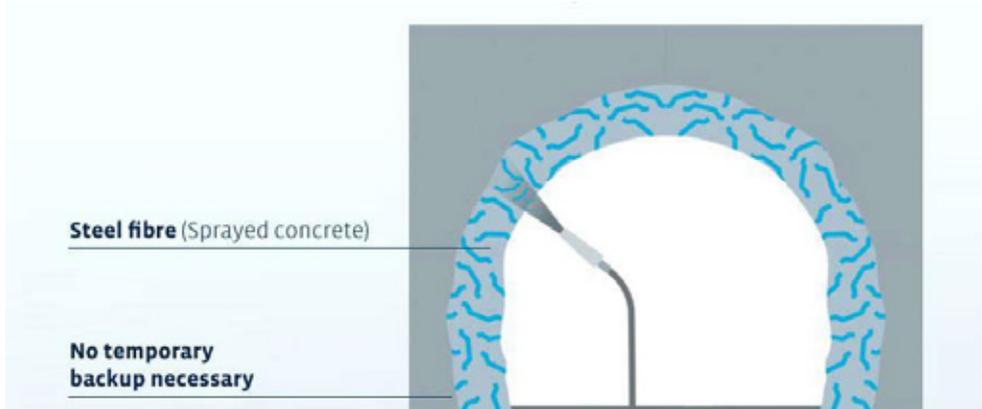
Solution with steel fibre reinforced sprayed concrete [3]
